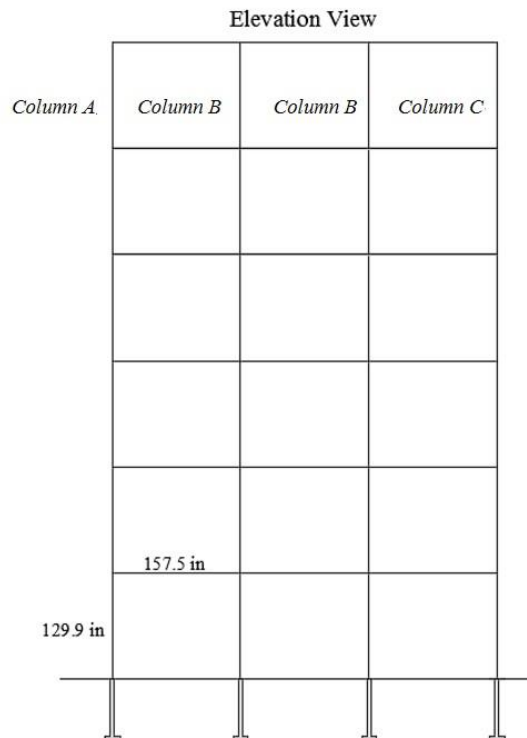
Elevation view of flat foundation building variation, design ID 12 in Table 2.
